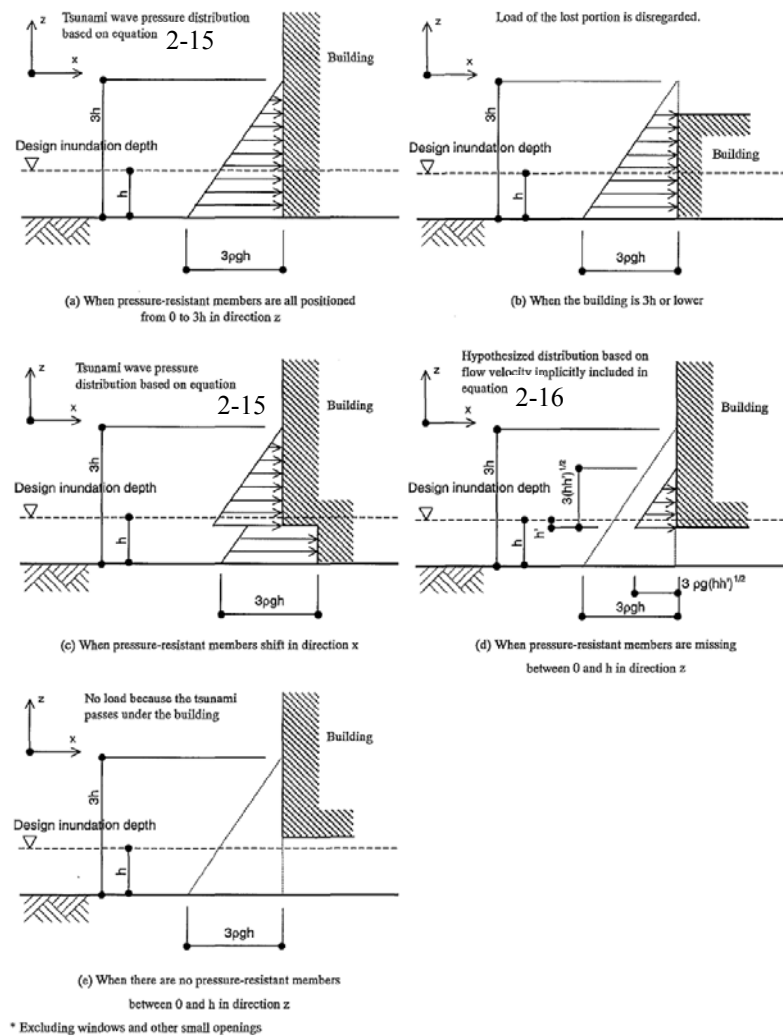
Tsunami wave pressure and force act on a building (Okada et al., 2005)
